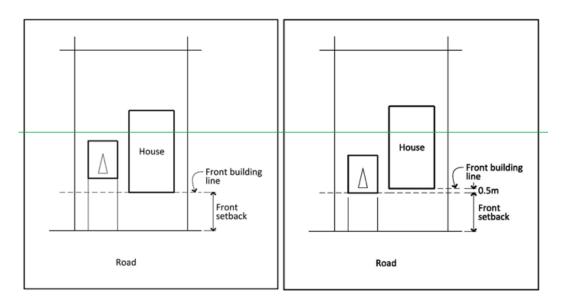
Setback for accessory buildings – example of a detached accessory building
